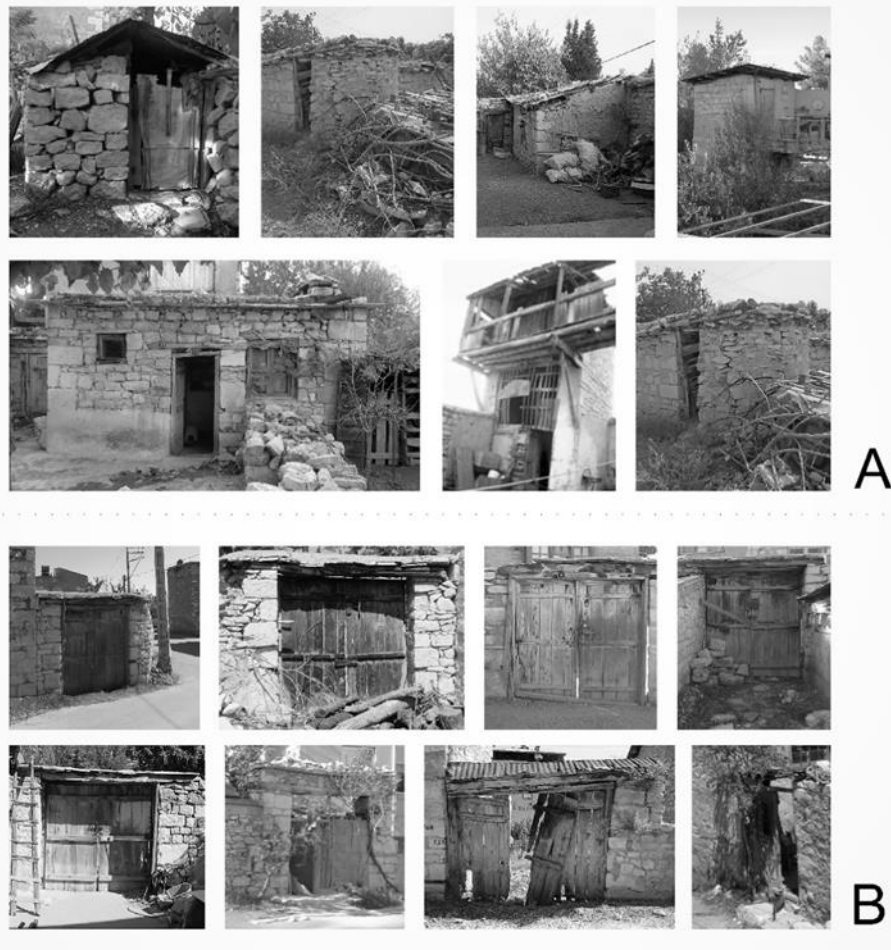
Annex buildings (Müştemilat) (A), The garden doors (Bordo) (B)
